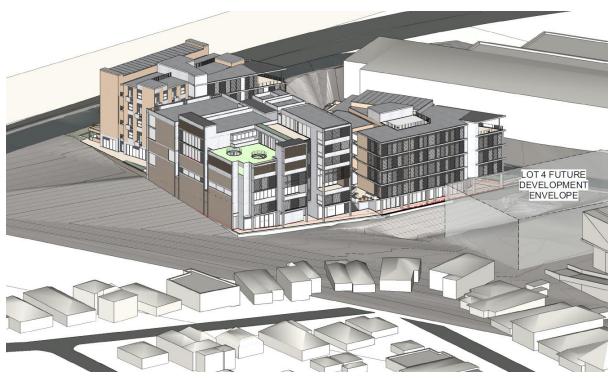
9am sun-eye diagram (Source: Drawing No. DA-160)
